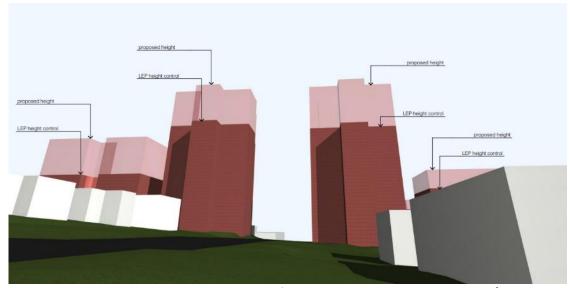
View southward along Mann Street of the 2016 Scheme at the Dwyer Street/Mann Street intersection between tower height of RL95.7 (75.7m). The subject proposal is at tower height 72.45m.
